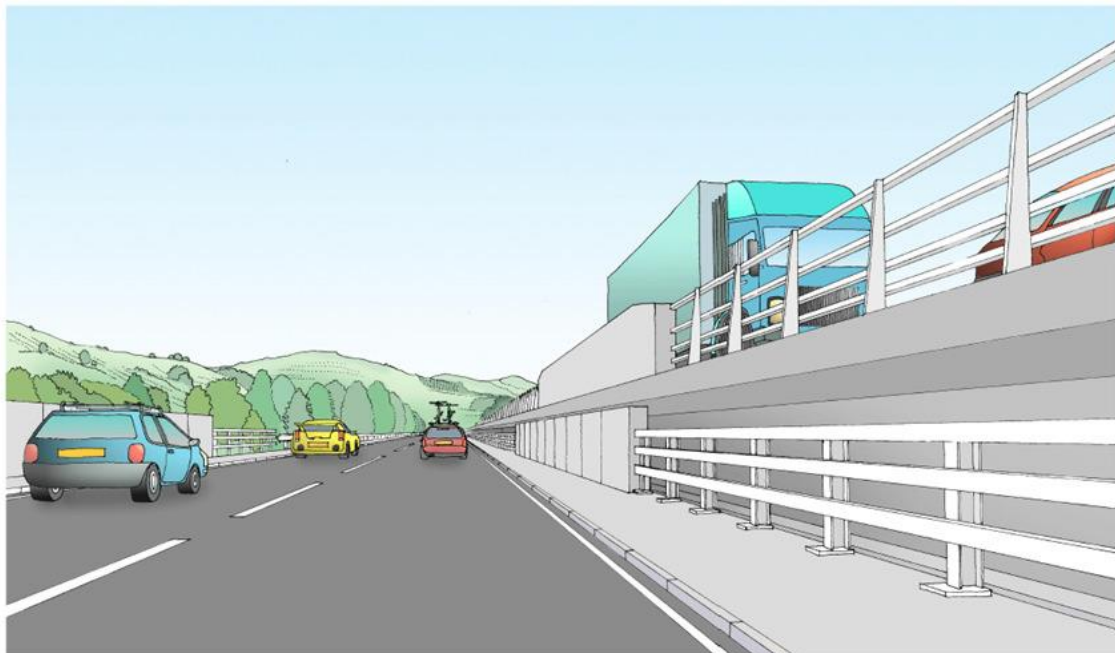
Pier in the watercourse option for Essangal Underbridge (assessed as the proposed scheme)
